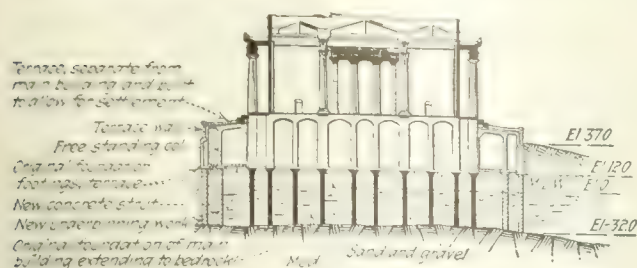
TERRACE UNDERPINNING IN CROSS-SECTION
